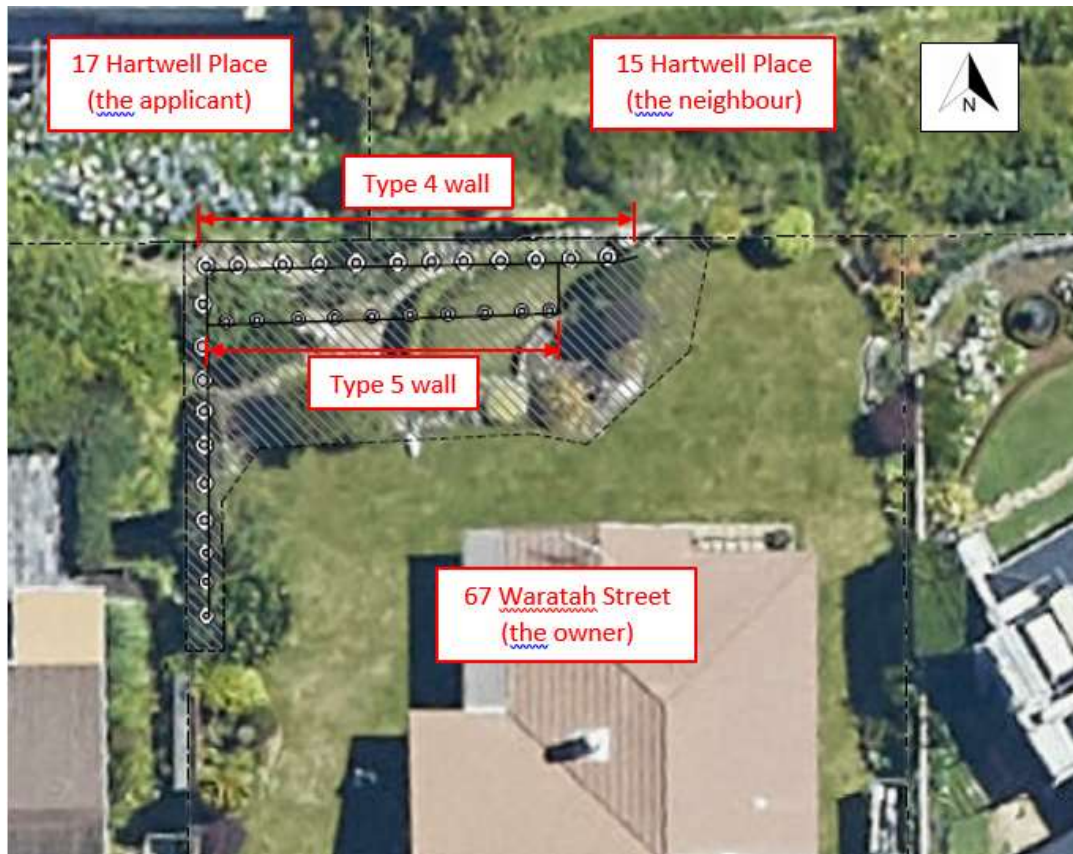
Site plan – indicative location of Type 4 and 5 retaining walls only (not to scale)
